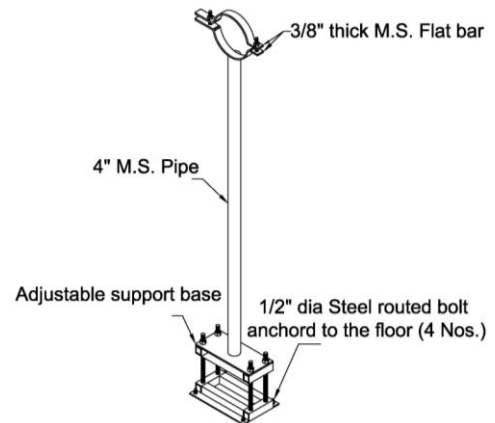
Adjustable Pipe support between PP1 discharge line and Y-connection
